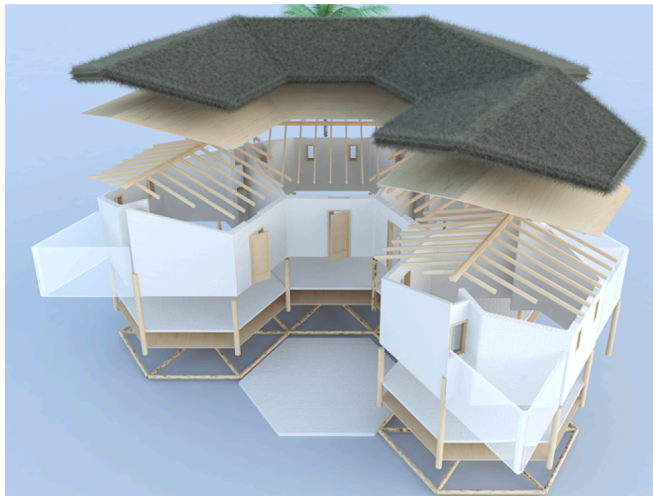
3D detailed model of the shelters showing the construction details (rendered in 3D MAX).
